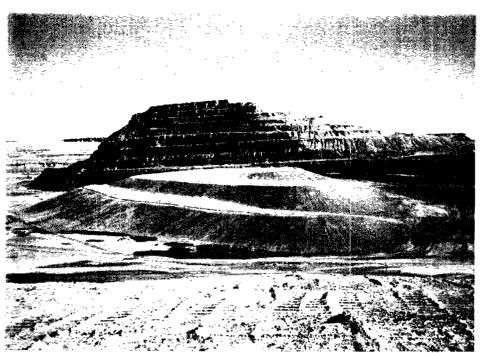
Topsoil cover on pile JP-PS-22 in JP-OP-41. (Below Gavilon Mesa)
